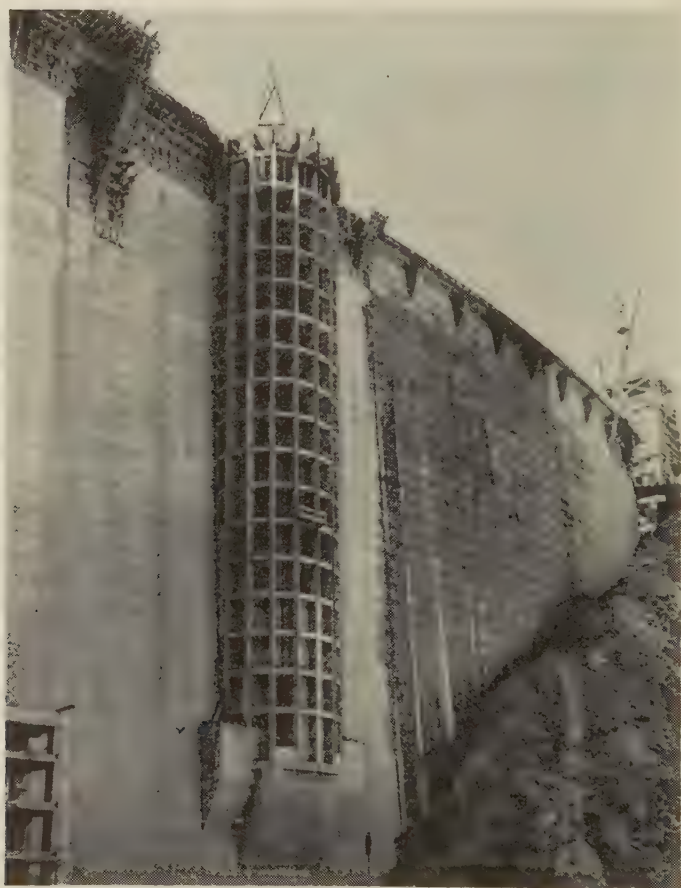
UPSTREAM FACE OF PINE CANYON DAM, INCLUDING OUTLET TOWER
